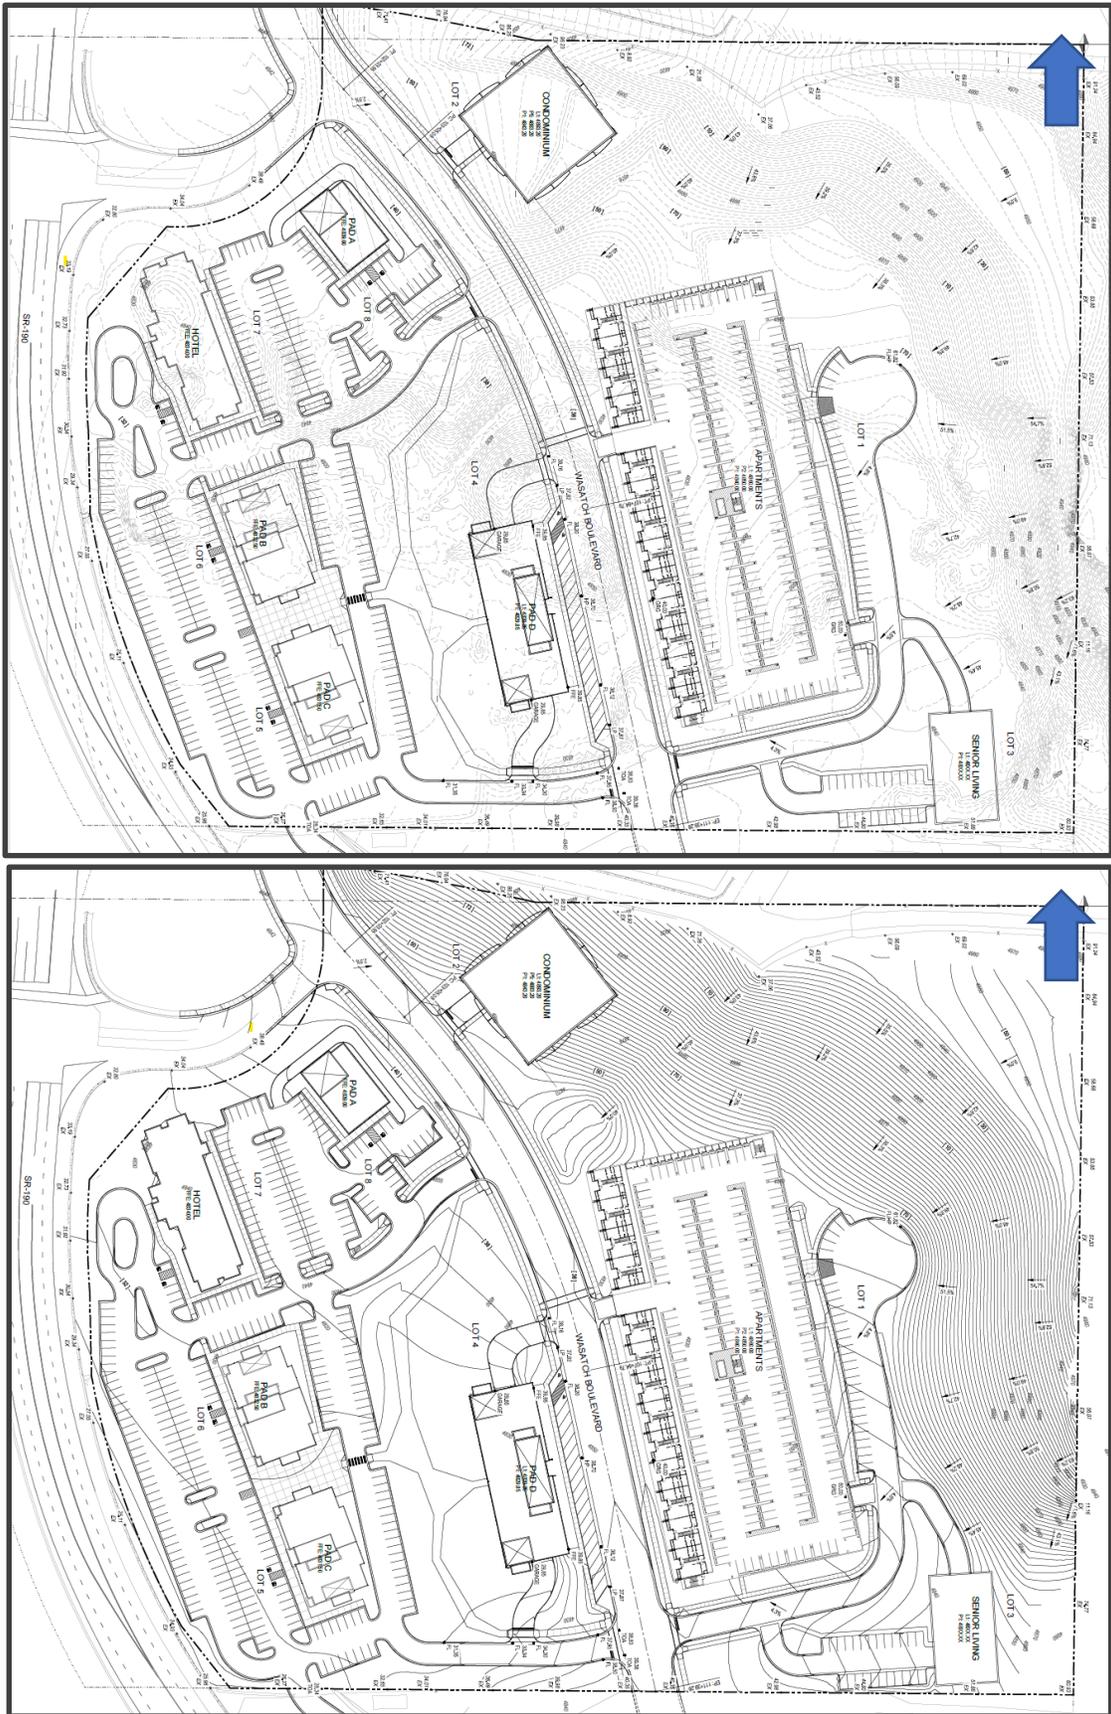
EXISTING AND PROPOSED SITE GRADING BASED ON OLD SITE PLAN LAYOUT.
